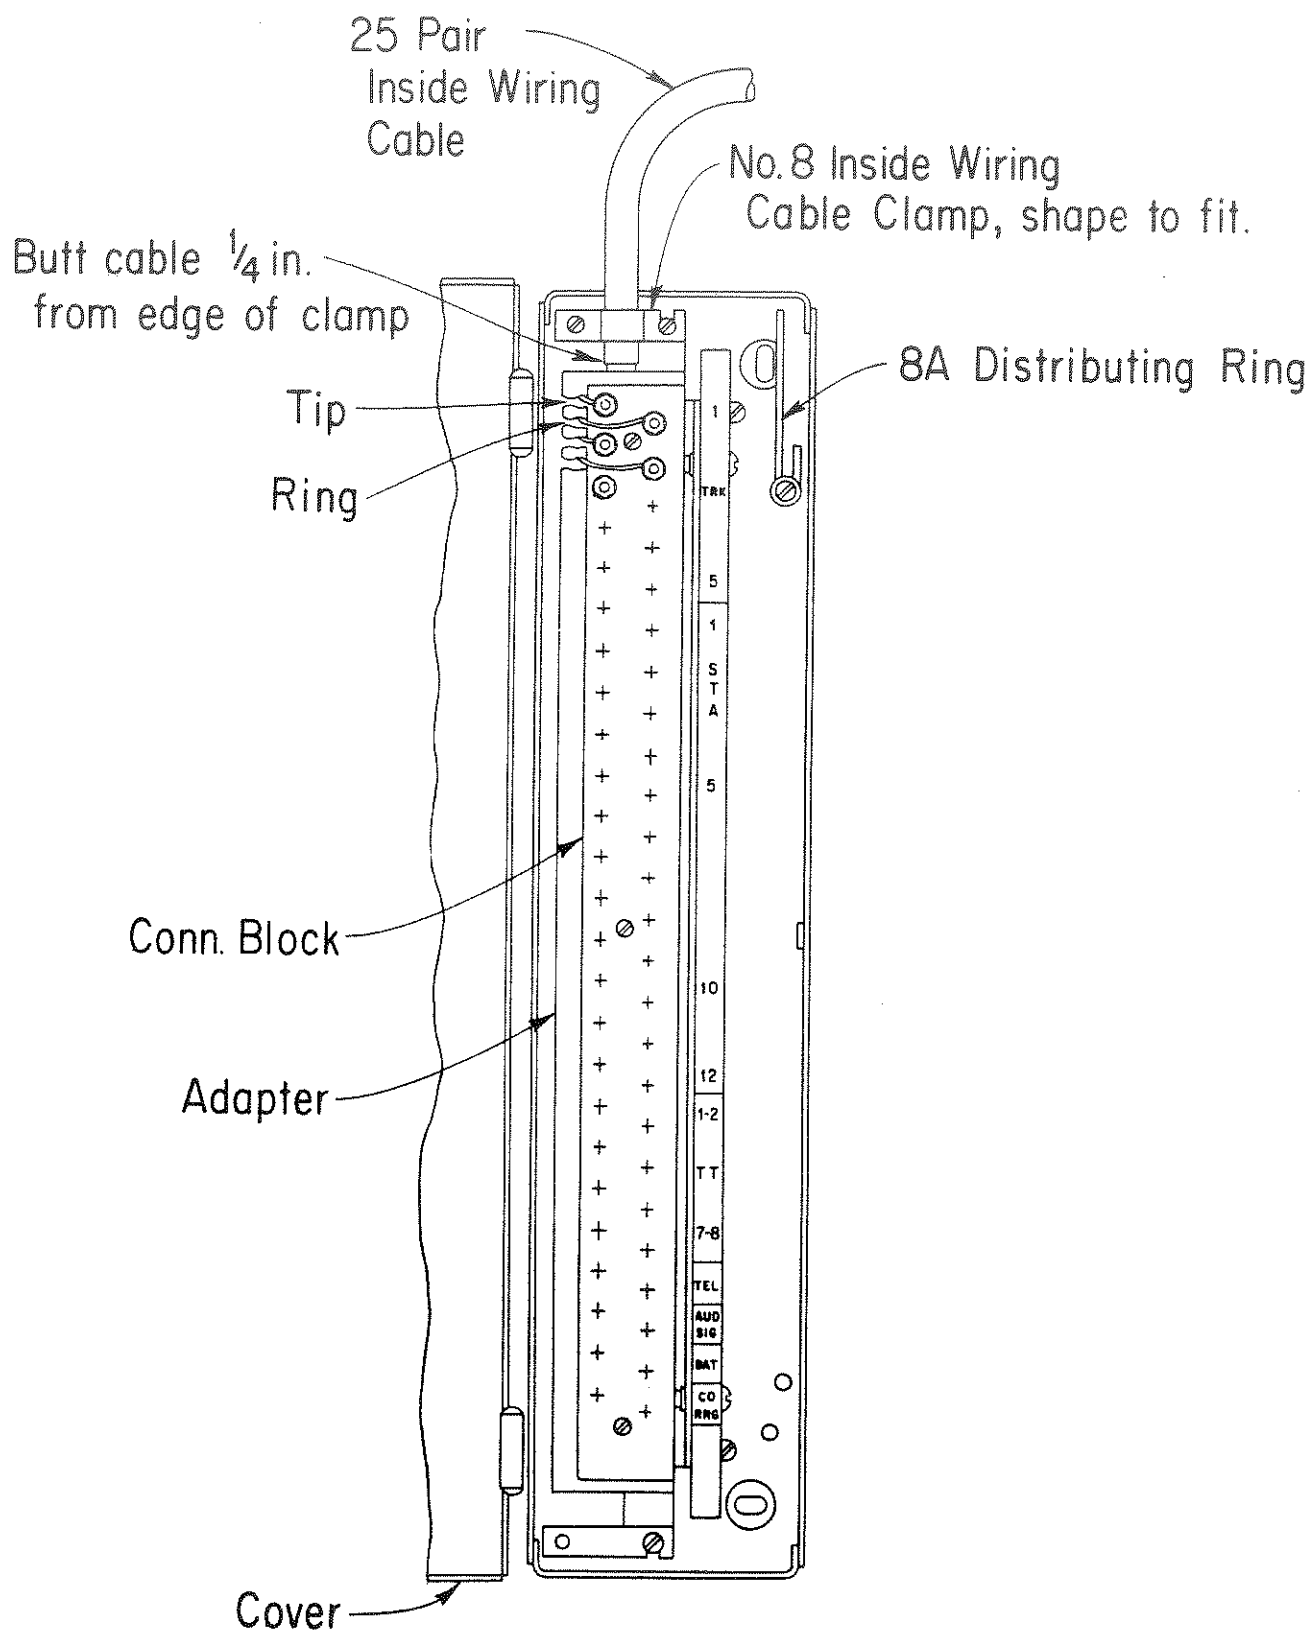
Typical Arrangement for 507B PBX with Prefabricated Sheet Metal or Die-Cast Chassis Using 25-Pair Cable
